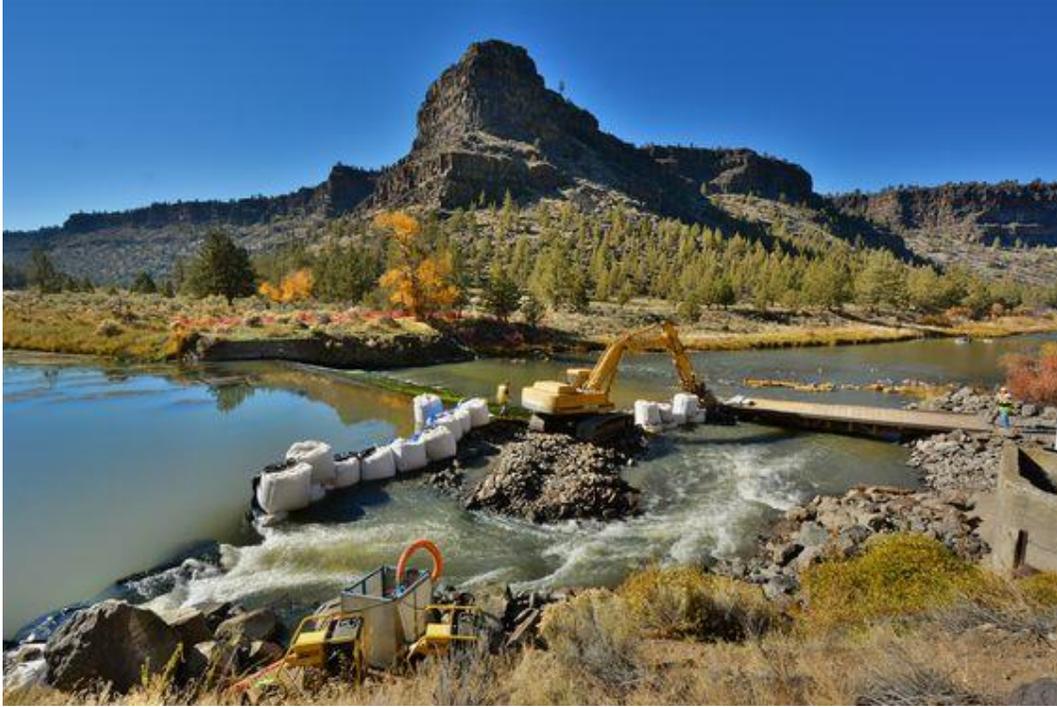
Cofferdam used to keep construction site dry during dam decommissioning project.
